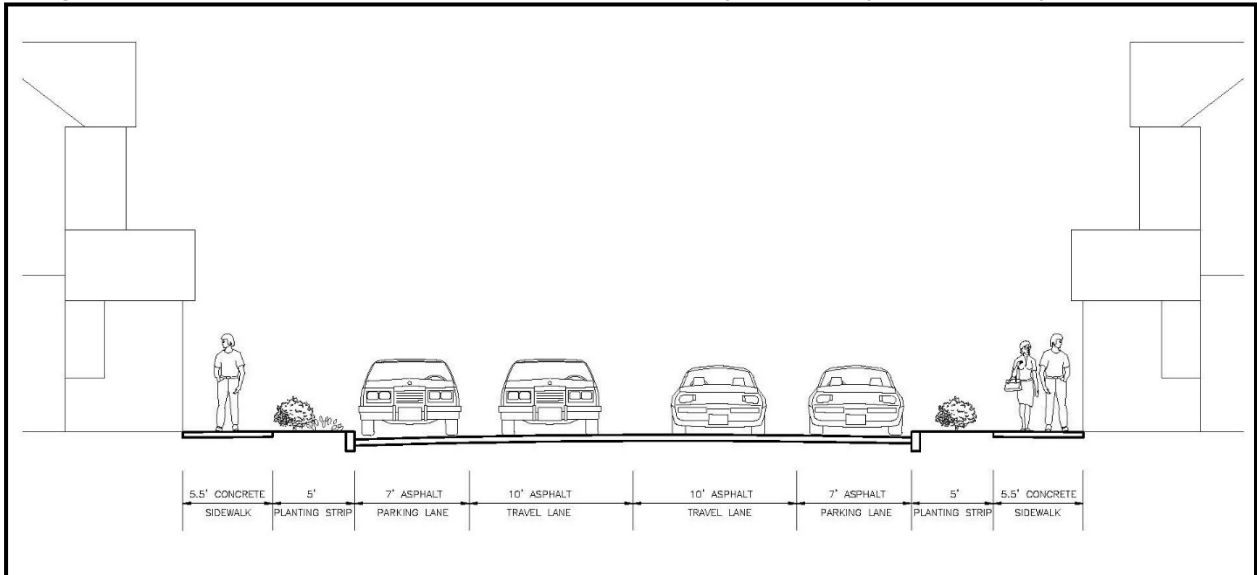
Commercial Connector Roads in Planned Development - Proposed Roadway Layout
